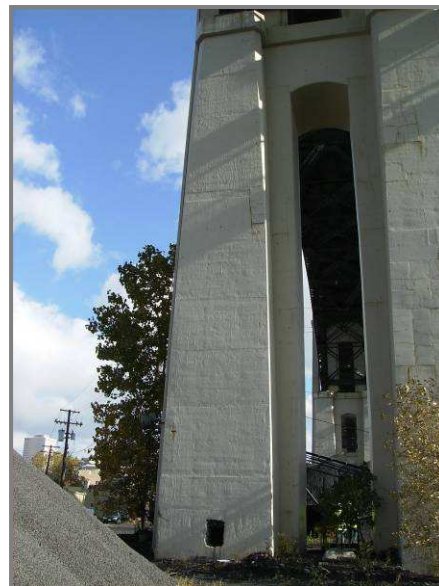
2'x2' drilled hole in the west face of the northernmost column at Pier 11.
